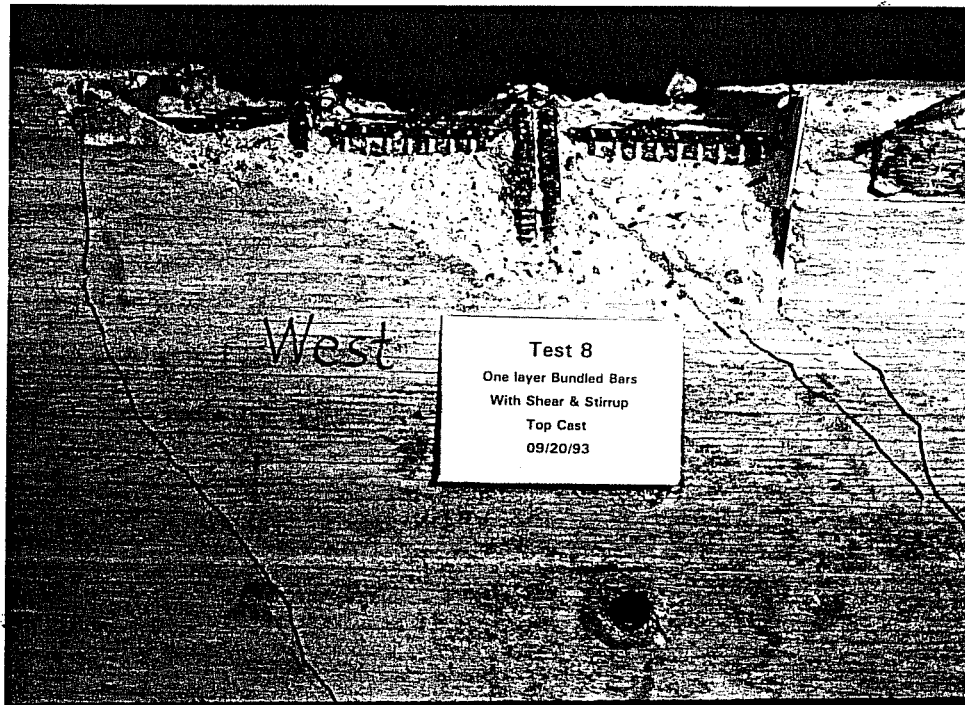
Failure at teflon sheet-bars with transverse reinforcement
